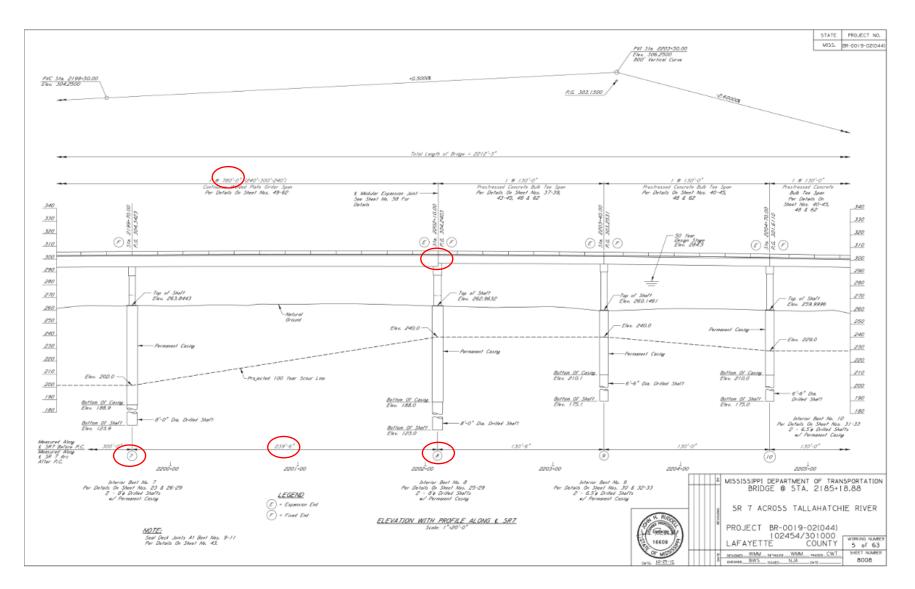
End of 780 ft steel-girder supported over Piers 7 and 8
